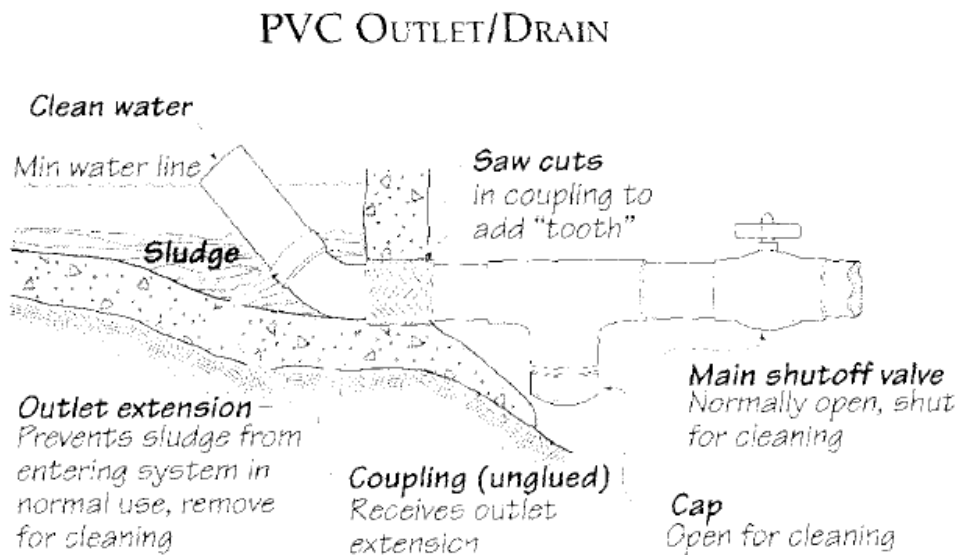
Outlet/Drain as one location. The removable outlet extension lets clean water in when in use and when removed allows sludge to drain out. (Ludwig 2005)
